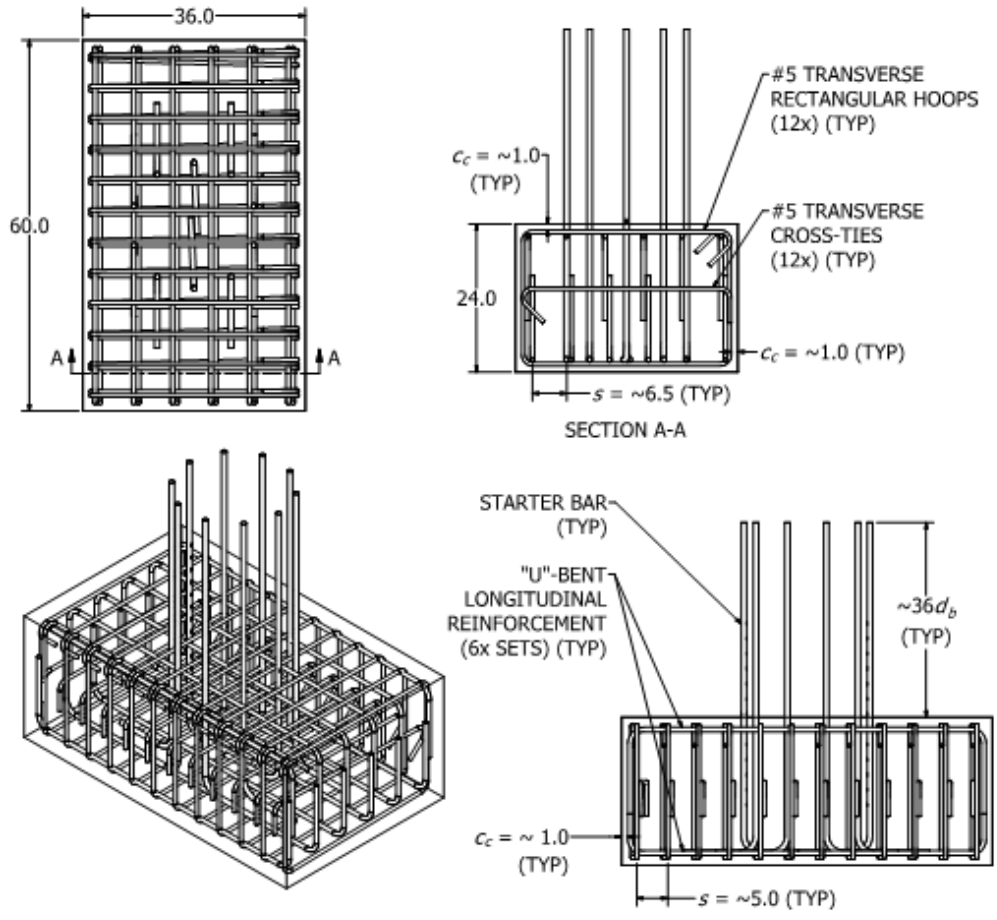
General Footing Reinforcement Details (10-#7 Starter Base Depicted) (Dimensions in Inches)
